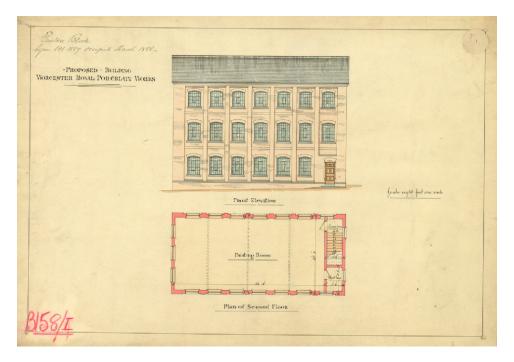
The east elevation and top floor of Building Q as planned in October 1888 by Thomas Sutton (source: Worcester Porcelain Museum)
